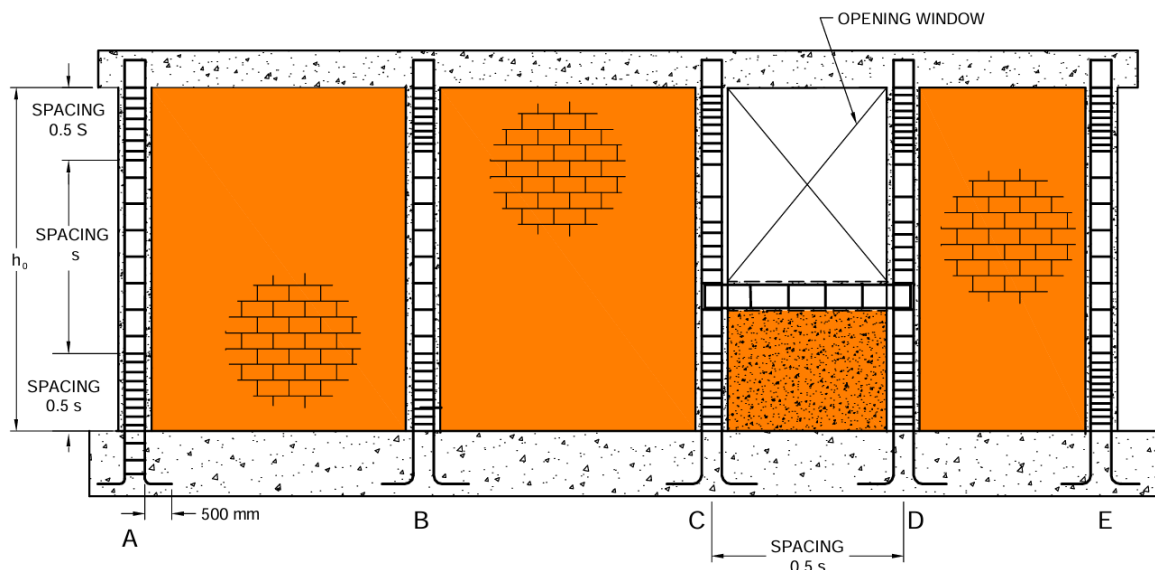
TIE-COLUMN TRANSVERSE REINFORCEMENT REQUIREMENTS
